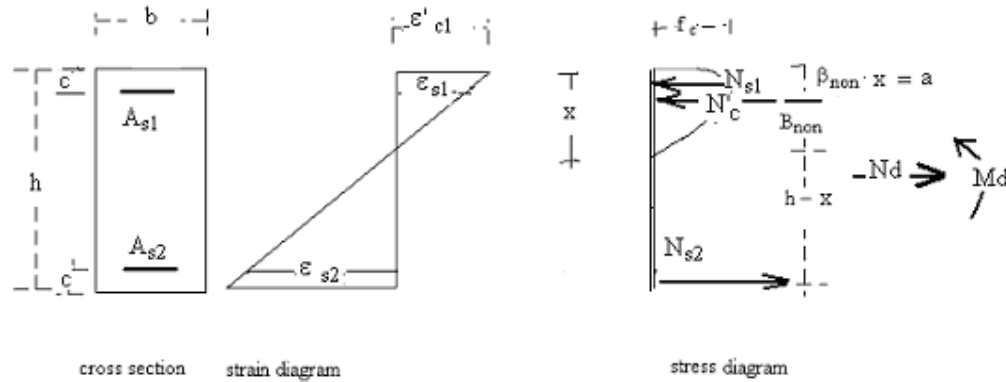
Stress strain diagram for rectangular reinforced concrete cross section subjected to moment and axial force.
